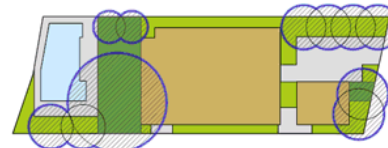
Test site 10 – Detached dwelling on 790m² R2 site (Woollahra Council diagram)
